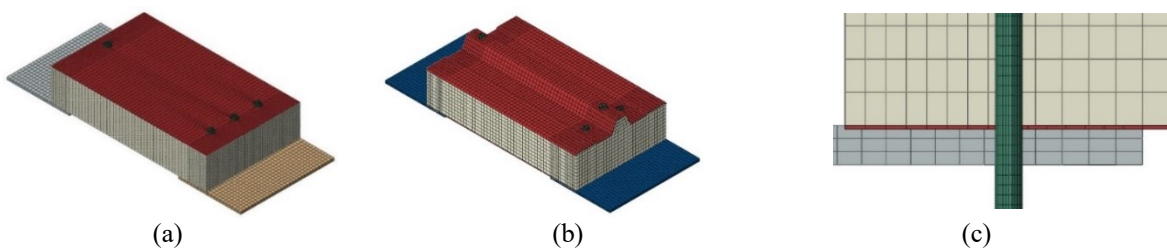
Meshing, a) the whole MW specimen, b) the whole PIR specimen, c) connection area
